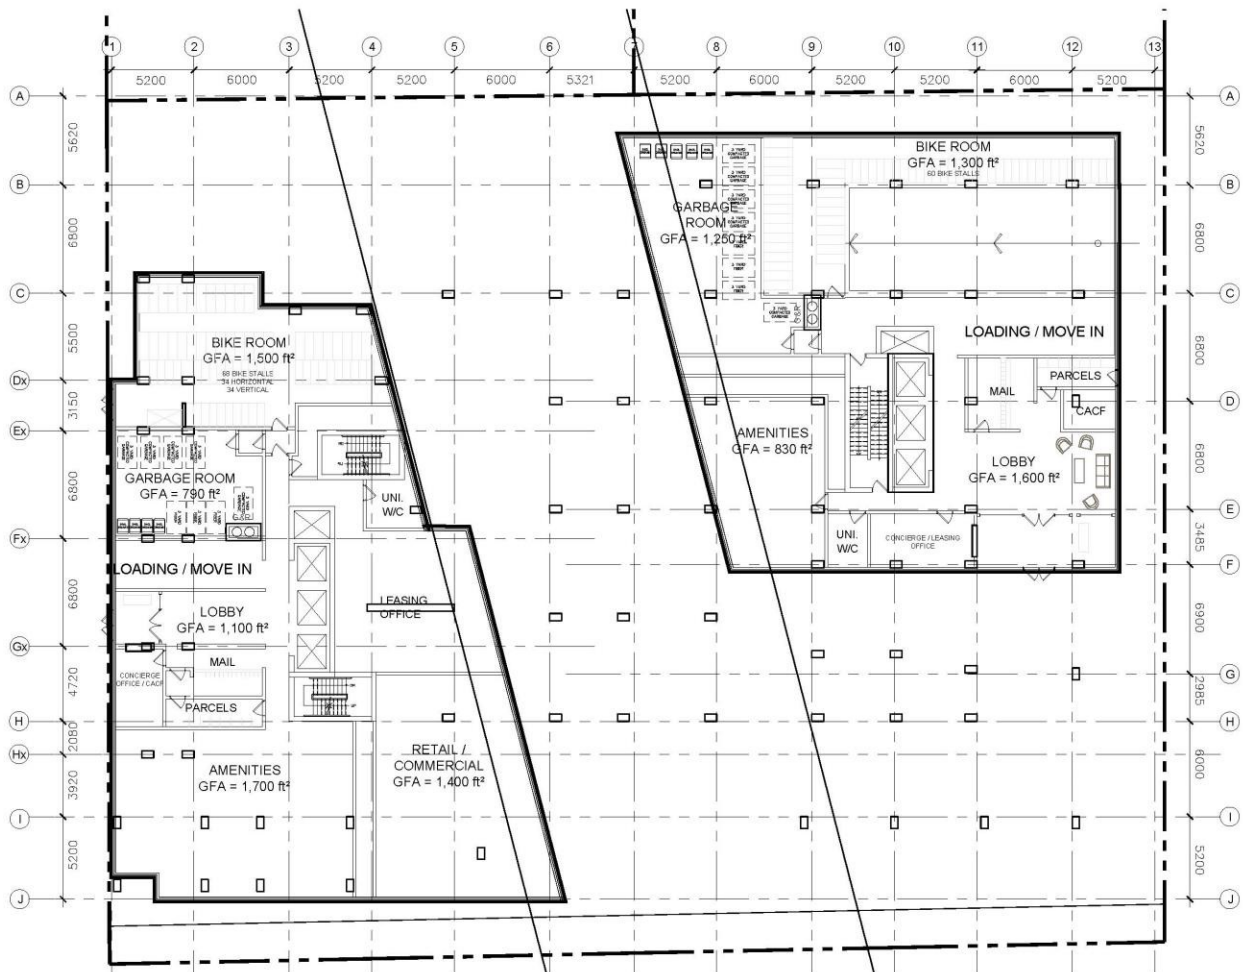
Ground floor plans of the two towers illustrating garage access from Gilmour Street, and a proposed retail / commercial use in the north tower fronting onto O'Connor Street. Source: Hobin Architecture July 2020.
